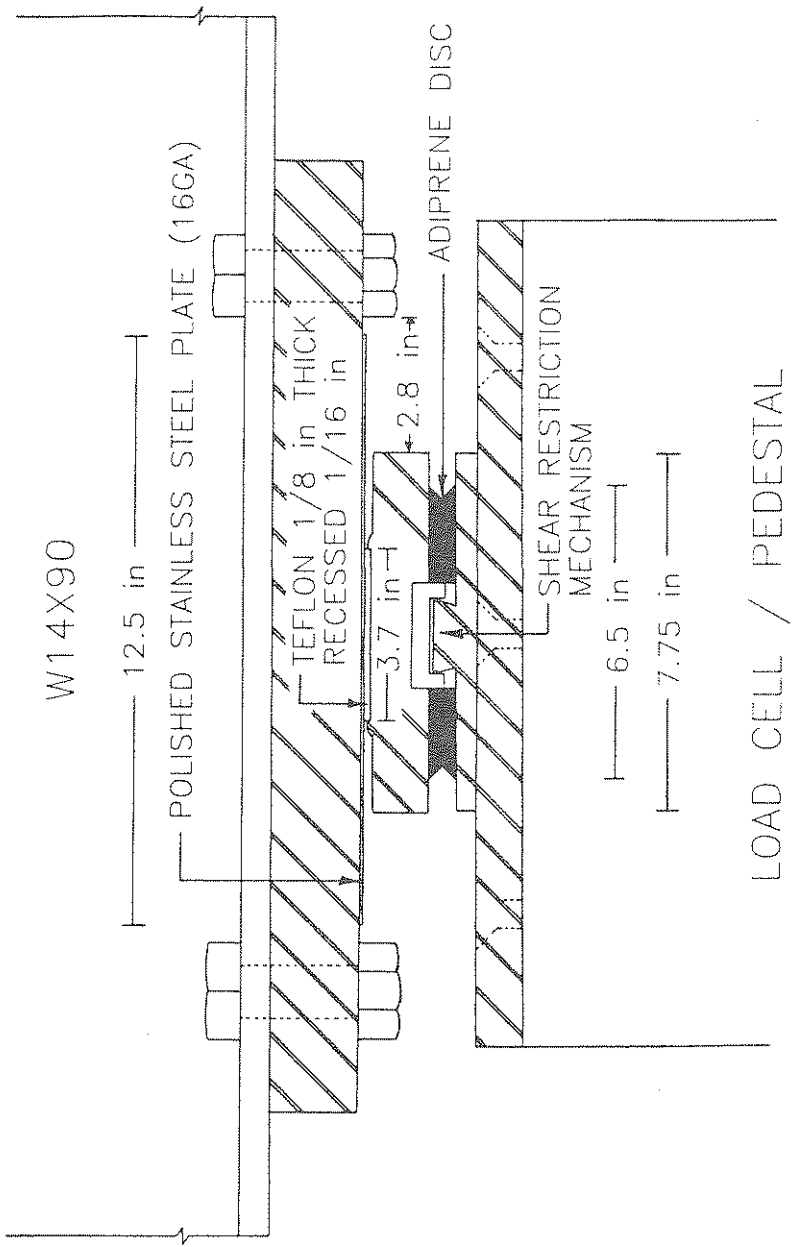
Teflon Disc Bearing Design (1 inch = 25.4mm).
